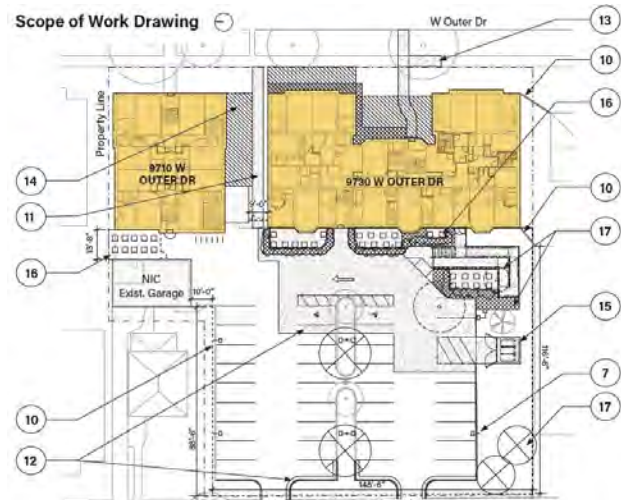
by applicant, continuation of Scope of Work map showing work items listed for buildings 9710 and 9730 W Outer Dr on a proposed site plan.
